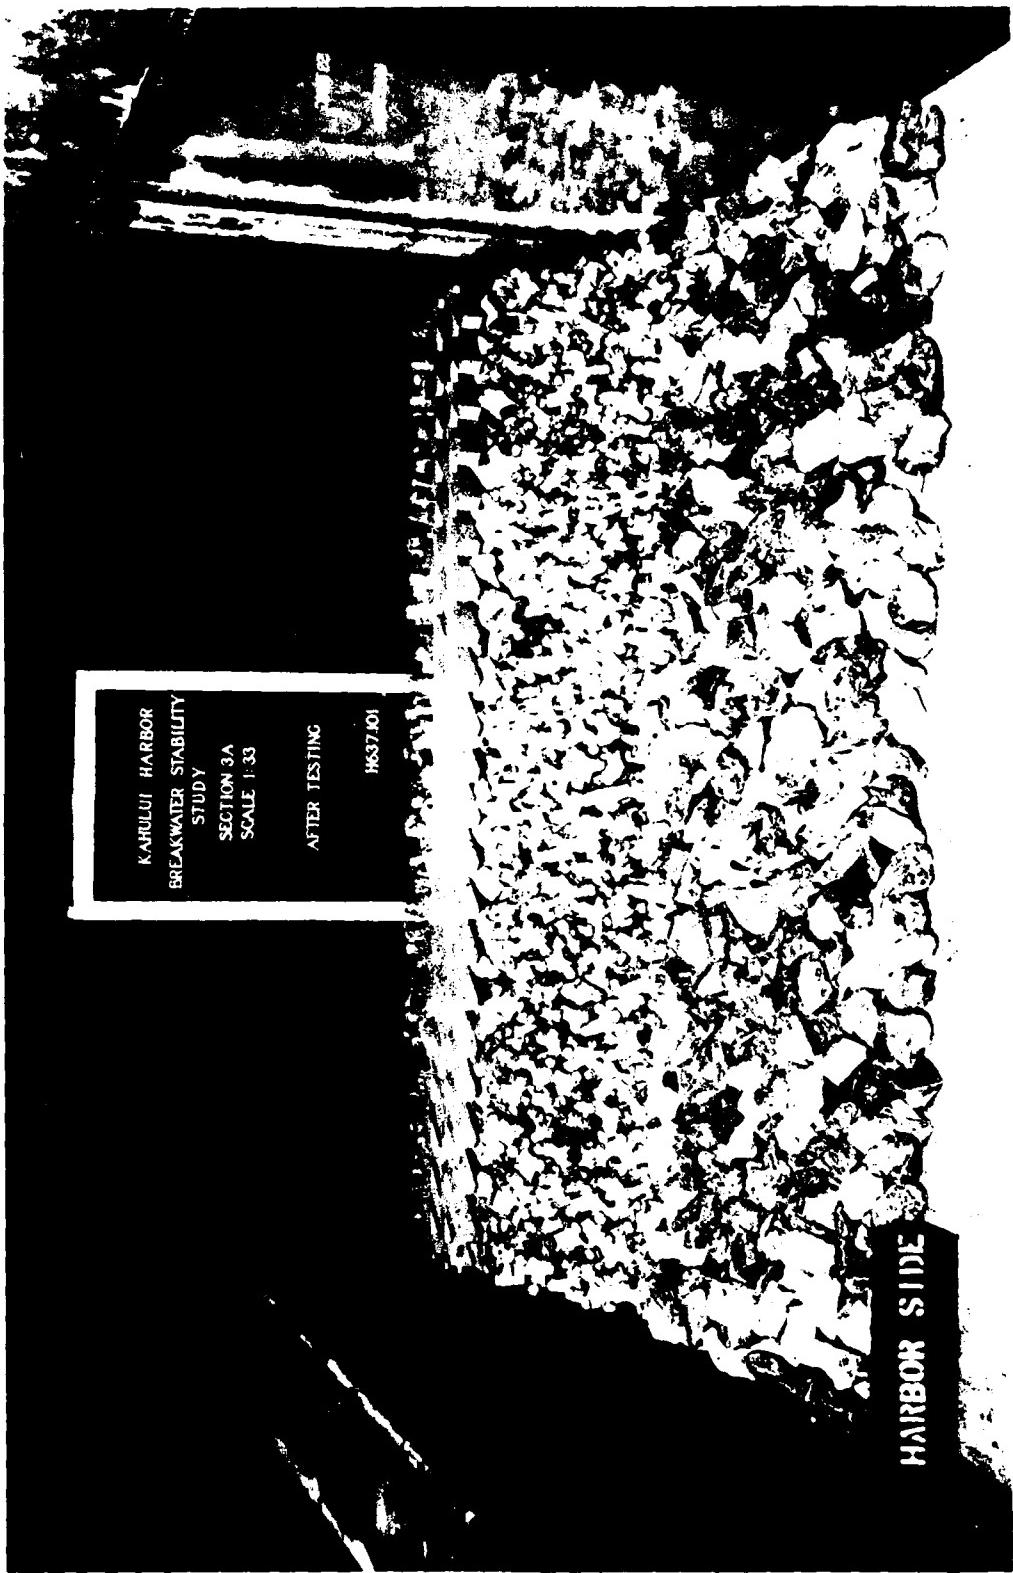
Harbor-side view of Plan 2A after testing, 2nd test
